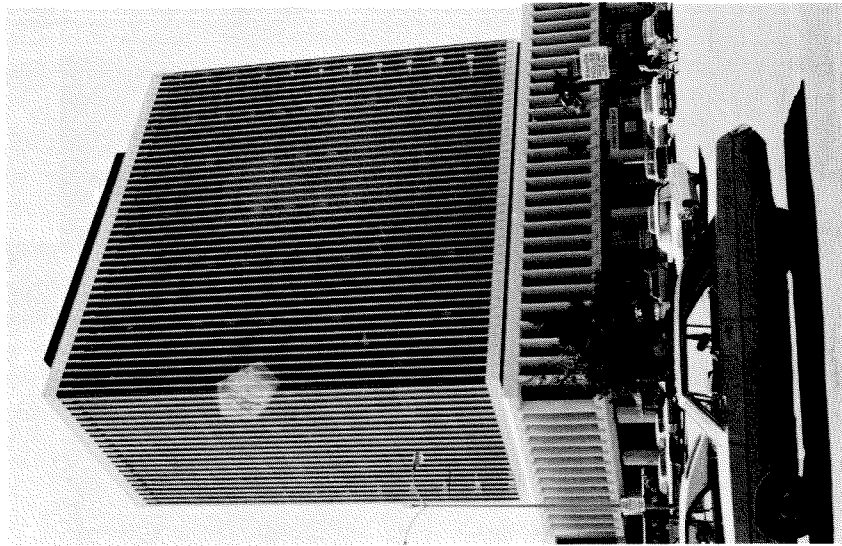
K-B Valley Center, 17-story steel-framed building, 15910 Ventura Boulevard, Encino.
